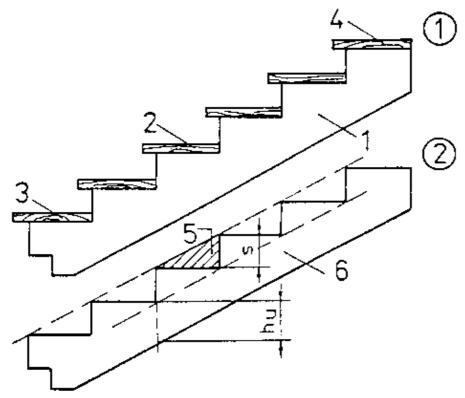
Saddle stairs – (1) sectional view of saddle stairs 1 stair string, 2 step, 3 stair foot (bottom step), 4 stair head (head step) – (2) sawn–out stair string s – height of rise, h_u – height of string bottom, 5 sawn–out rise triangle, 6 string bottom
